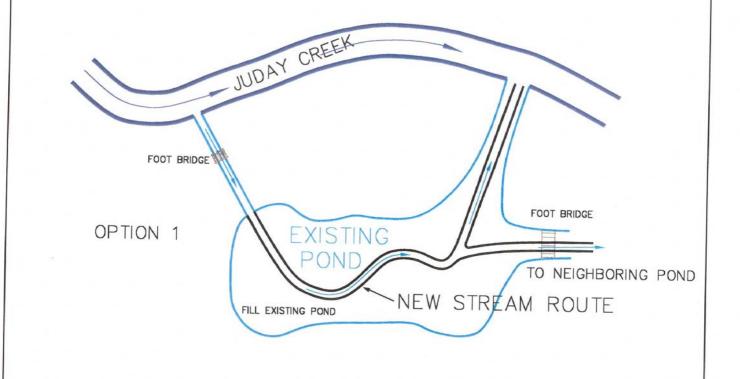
Plan View— Pond Fill/Constructed Stream Channel Juday Creek Feasibility Study
